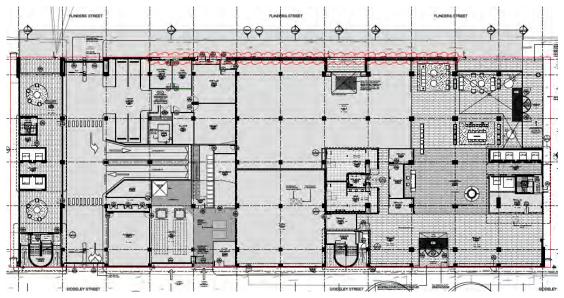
Proposed Ground Level Plan. From Drawing A21-001
